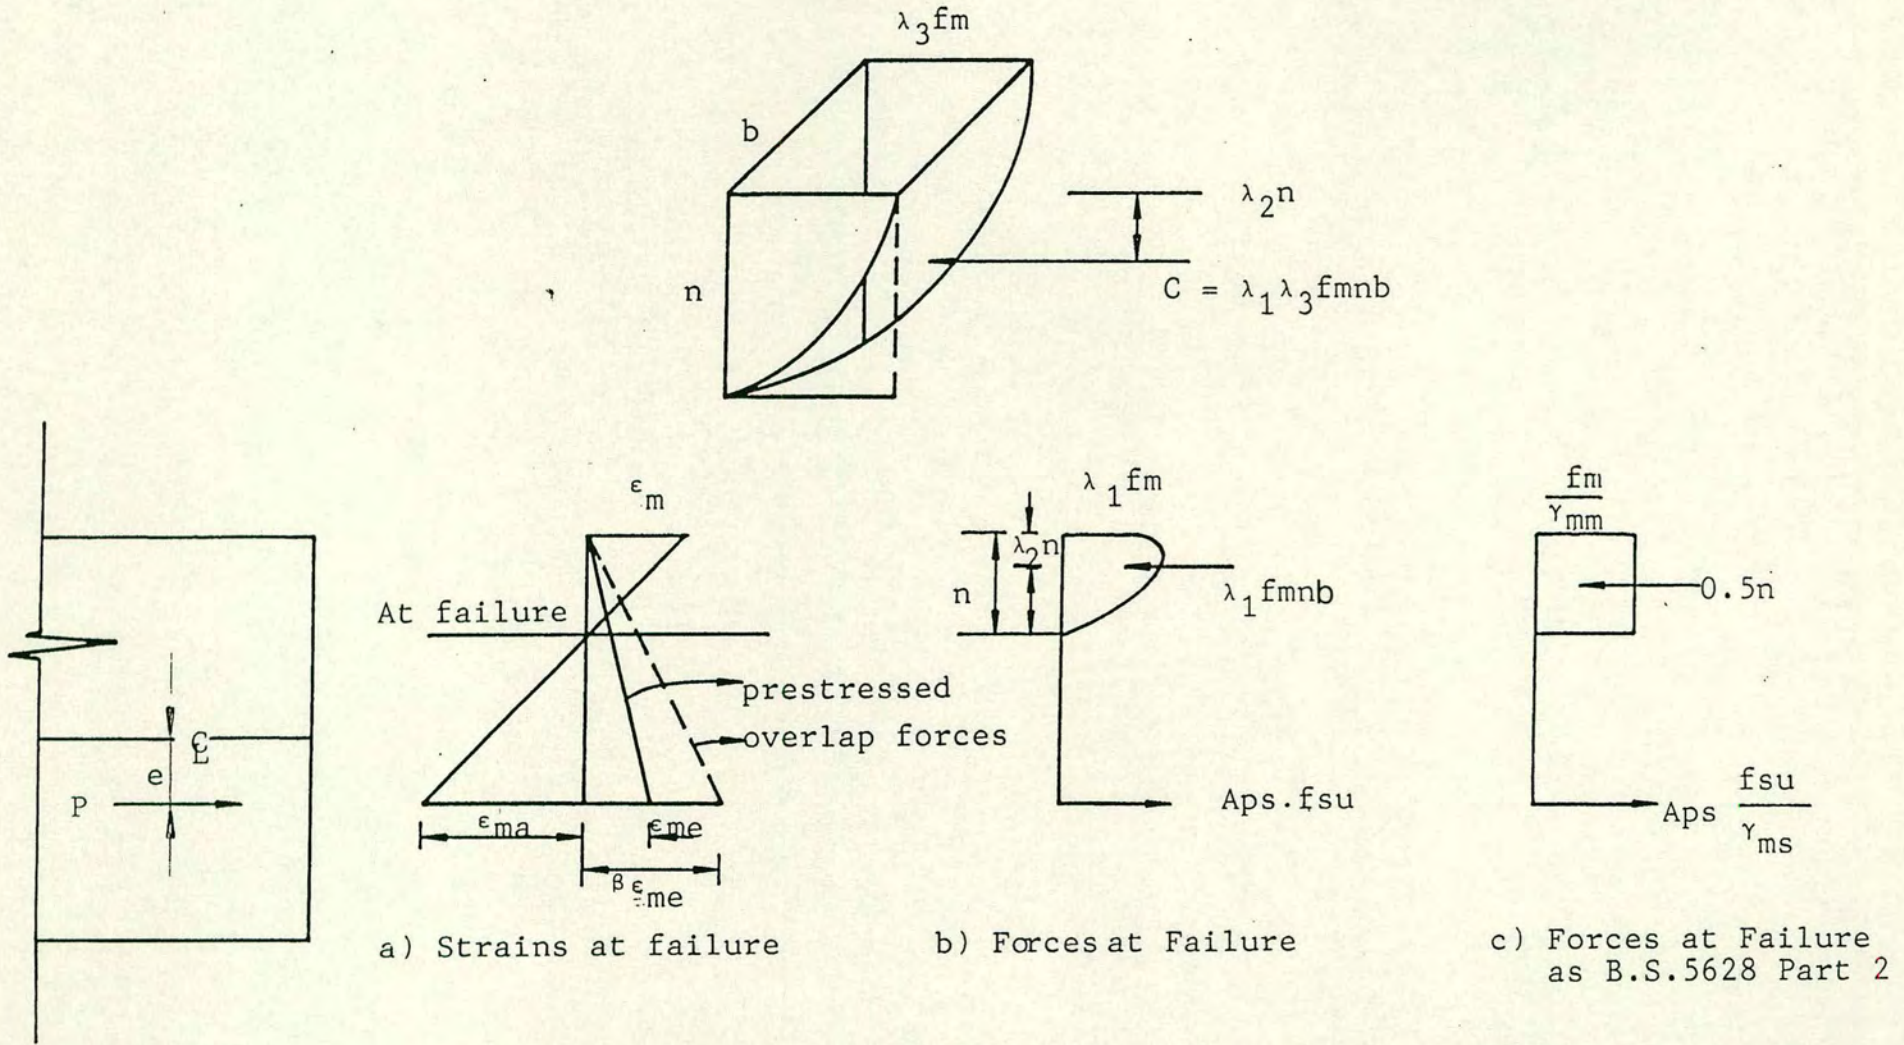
Conditions at failure in a prestressed brickwork wall
